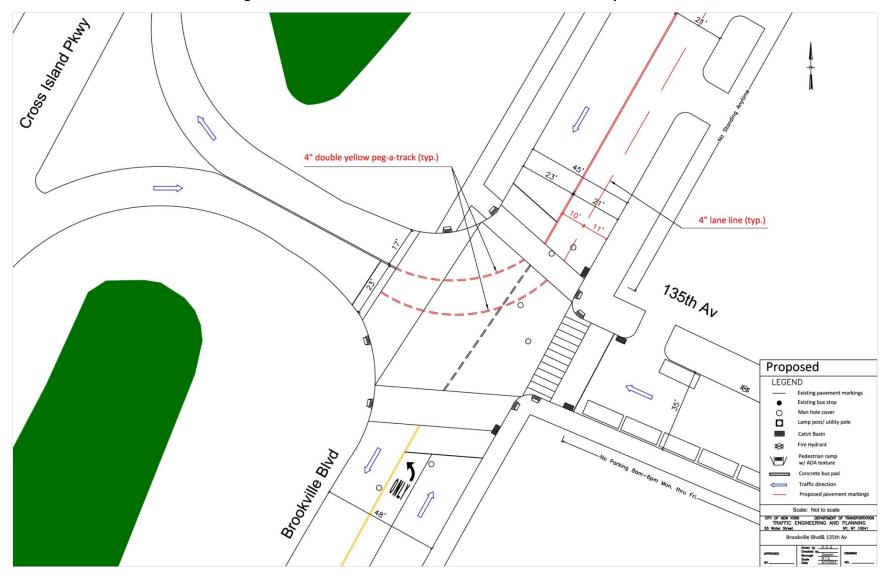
Brookville Boulevard and 135th Avenue - Proposed
